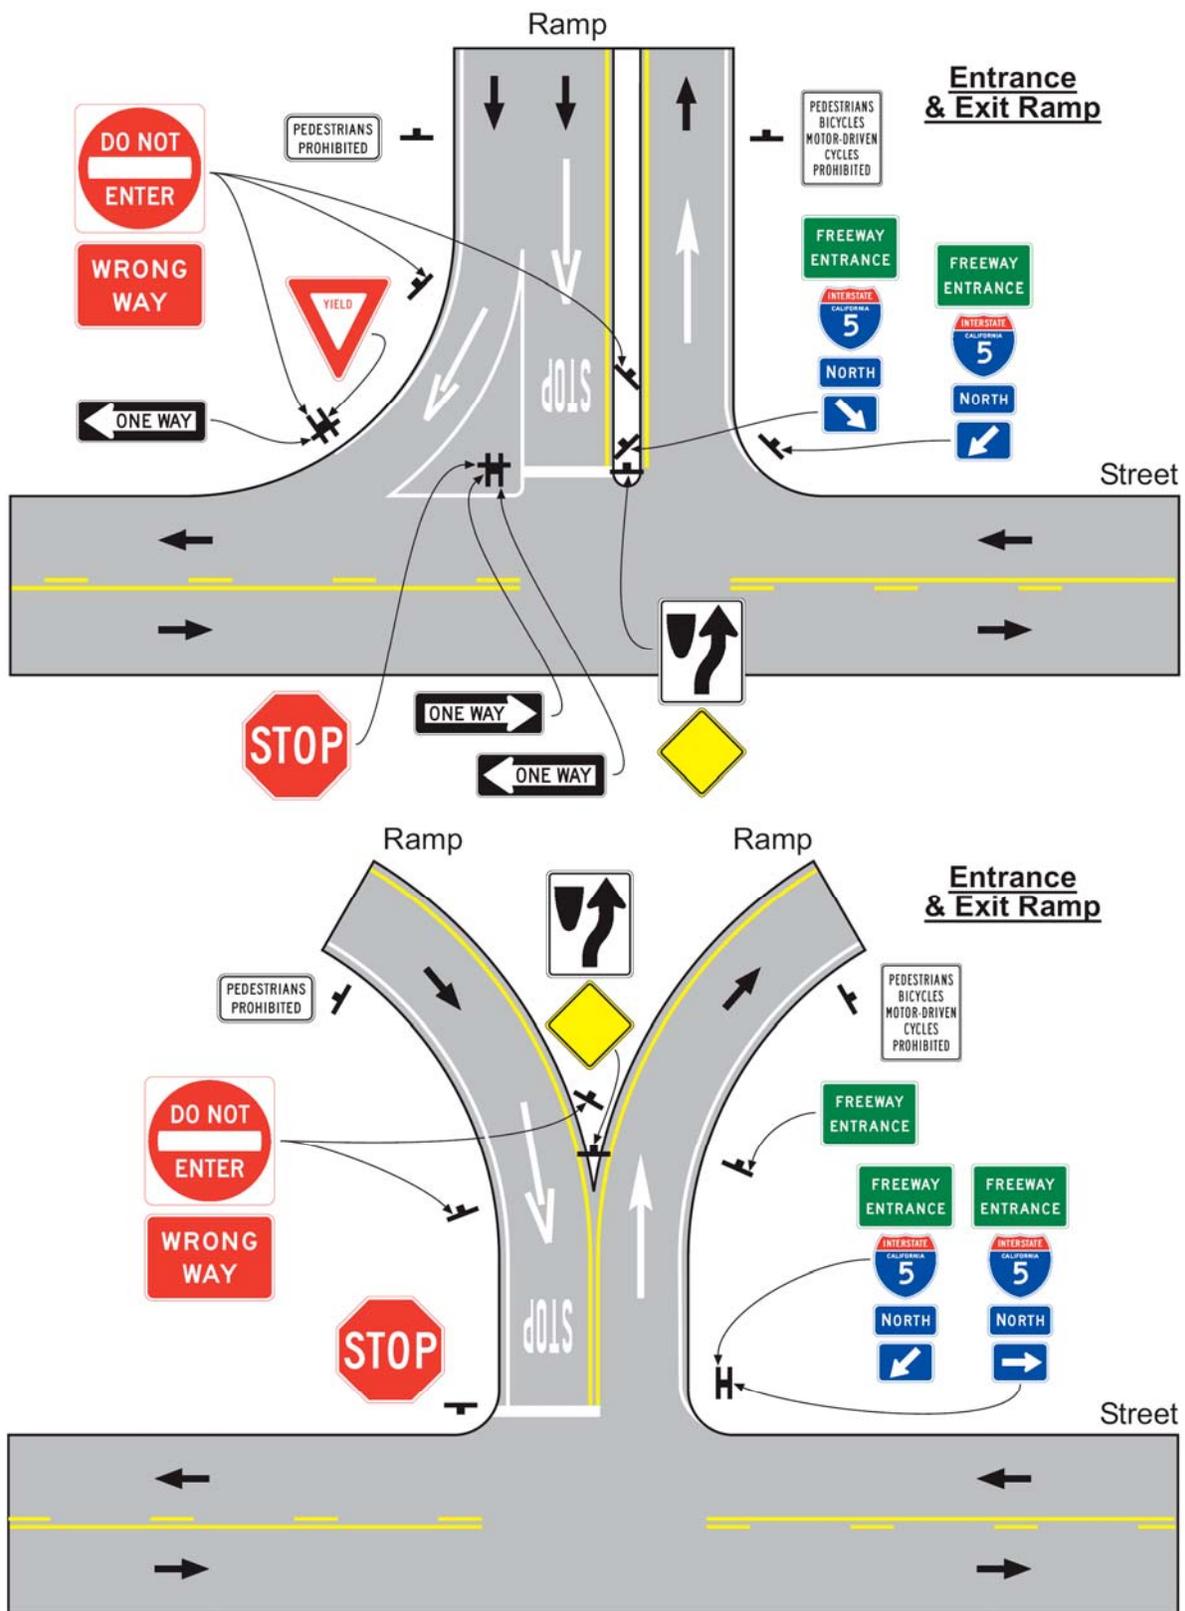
E-39 (CA). Examples of Regulatory Signing and Pavement Markings at Ramp Terminations to Deter Wrong-Way Entry (Sheet 4 of 5)
